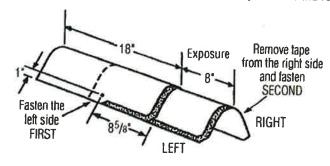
Installation of Sbangle® Ridge sbingles on bips and ridges.
